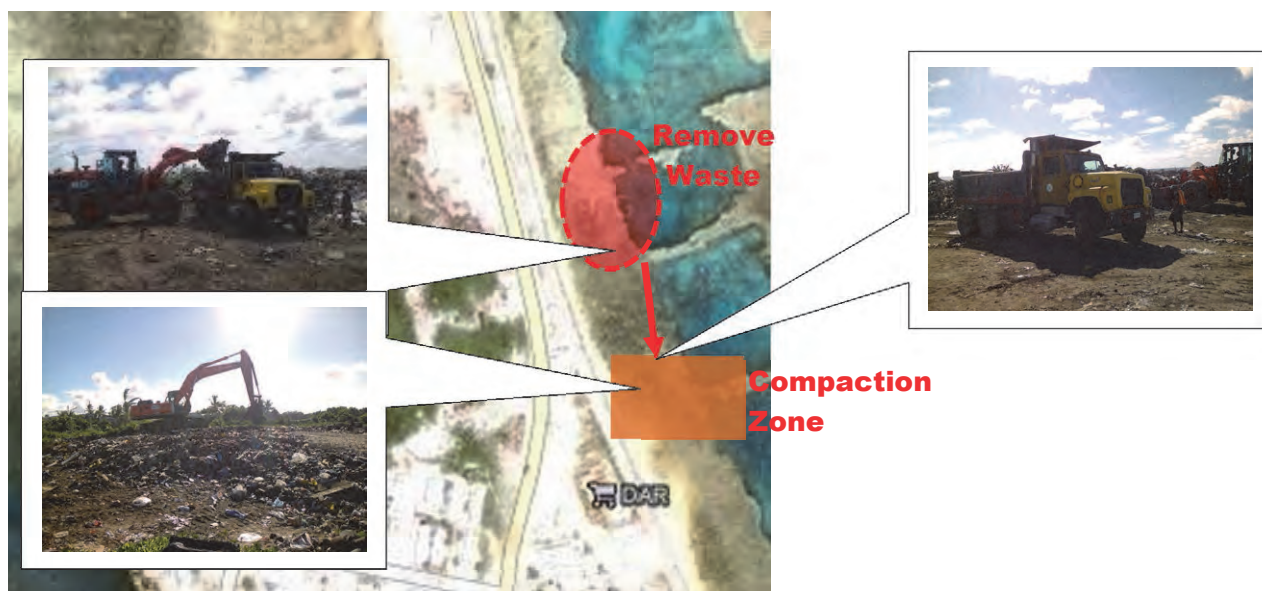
Improvement plan at the dump site (Revised in October 2014)
